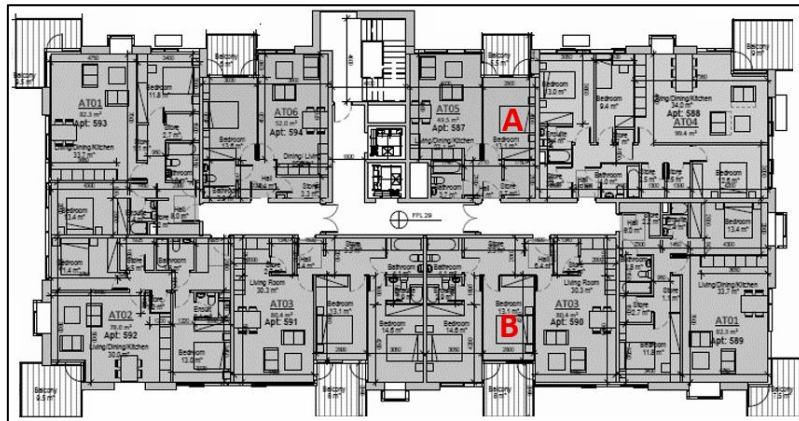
Block 8 Level 02 - Assessed Rooms
